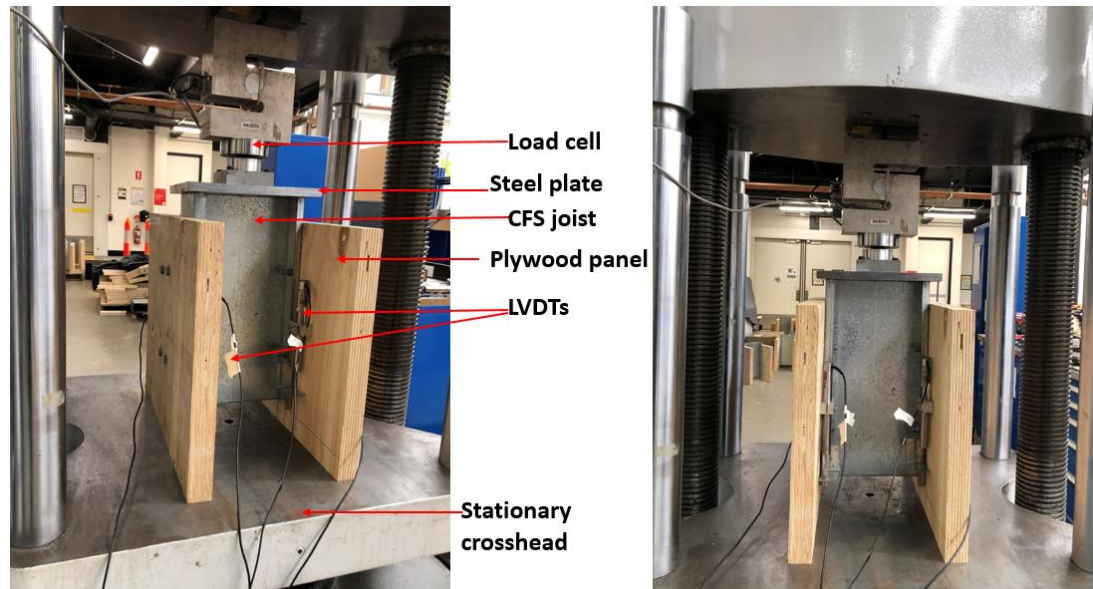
Experimental setup for push-out test in Shimadzu universal testing machine
